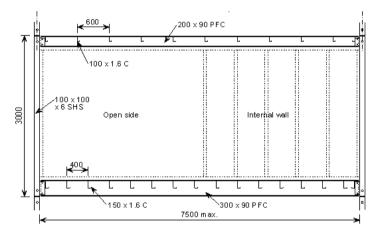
Longitudinal Edge Beams of an Open-Sided Module (SteelConstruction.info, 2012).
